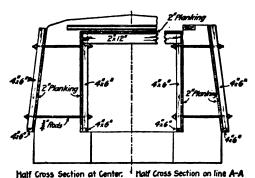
Plan of Concrete Forms for Rail Top Culverts.
